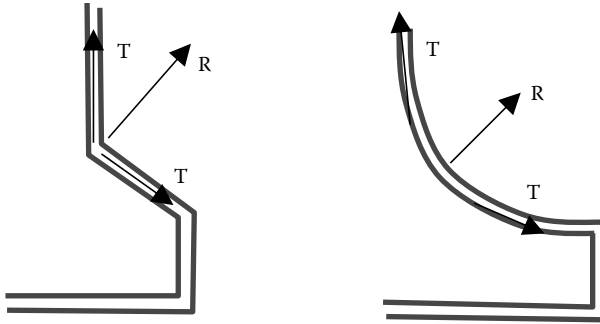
Inside corners and concave surfaces needing extra detailing.
